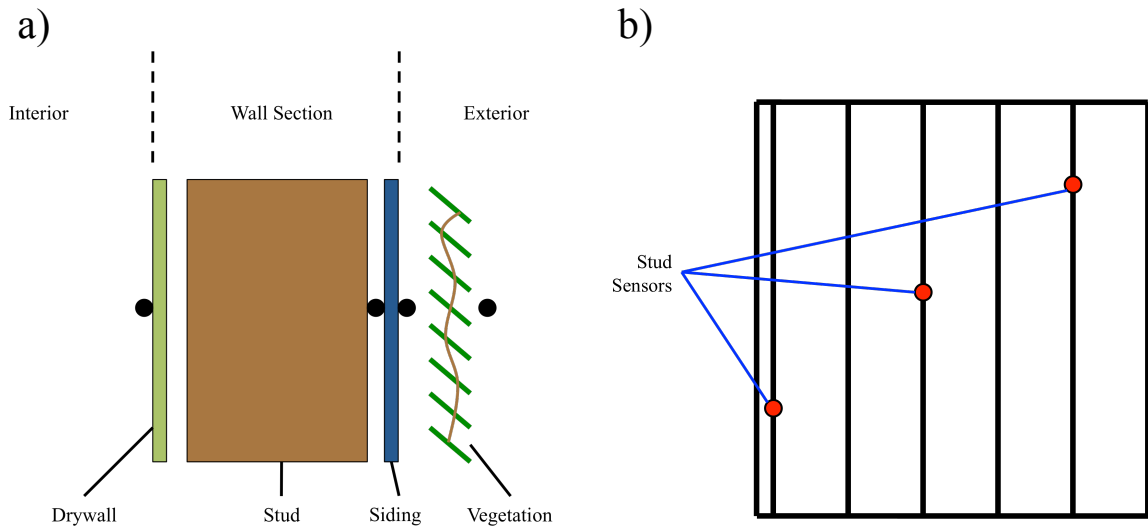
a) Cross-sectional diagram of profile of thermistors located across the instrumented wall from exterior (10 cm from vegetation surface) to the interior wall surface. b) Diagonal pattern of sensor profile locations evenly spaced across wall
